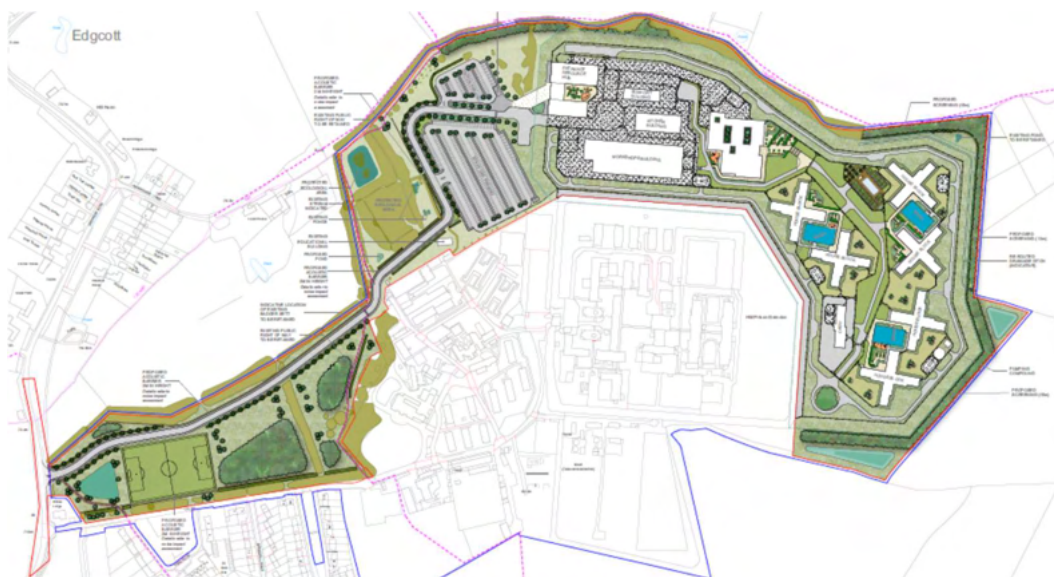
Schematic of proposed plan showing road and access point to the main construction area and final site
